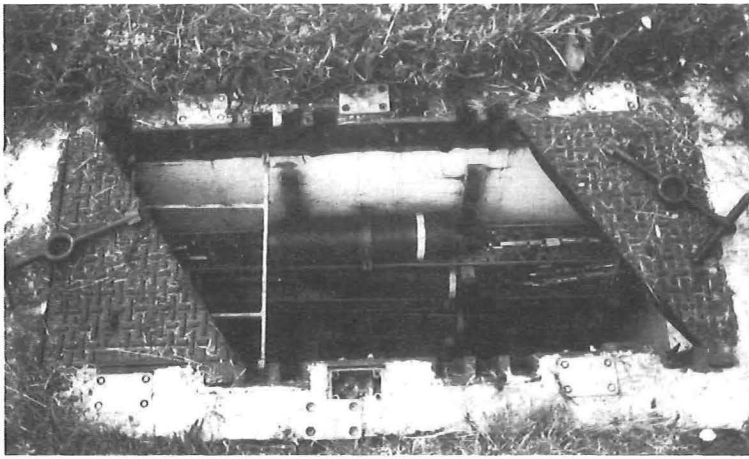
Carriageway joint box housing primary-to-secondary interconnection point
